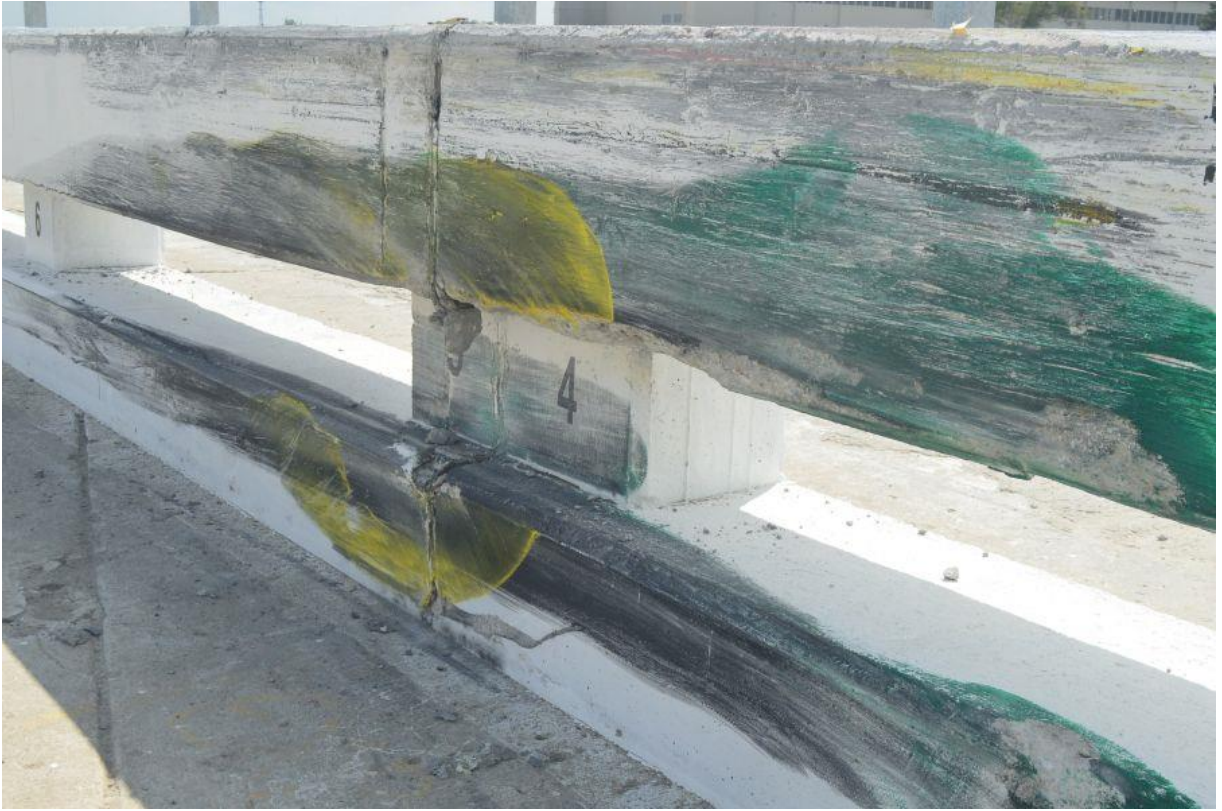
Curb and Concrete Rail Damage, Test No. HNTBR-2
